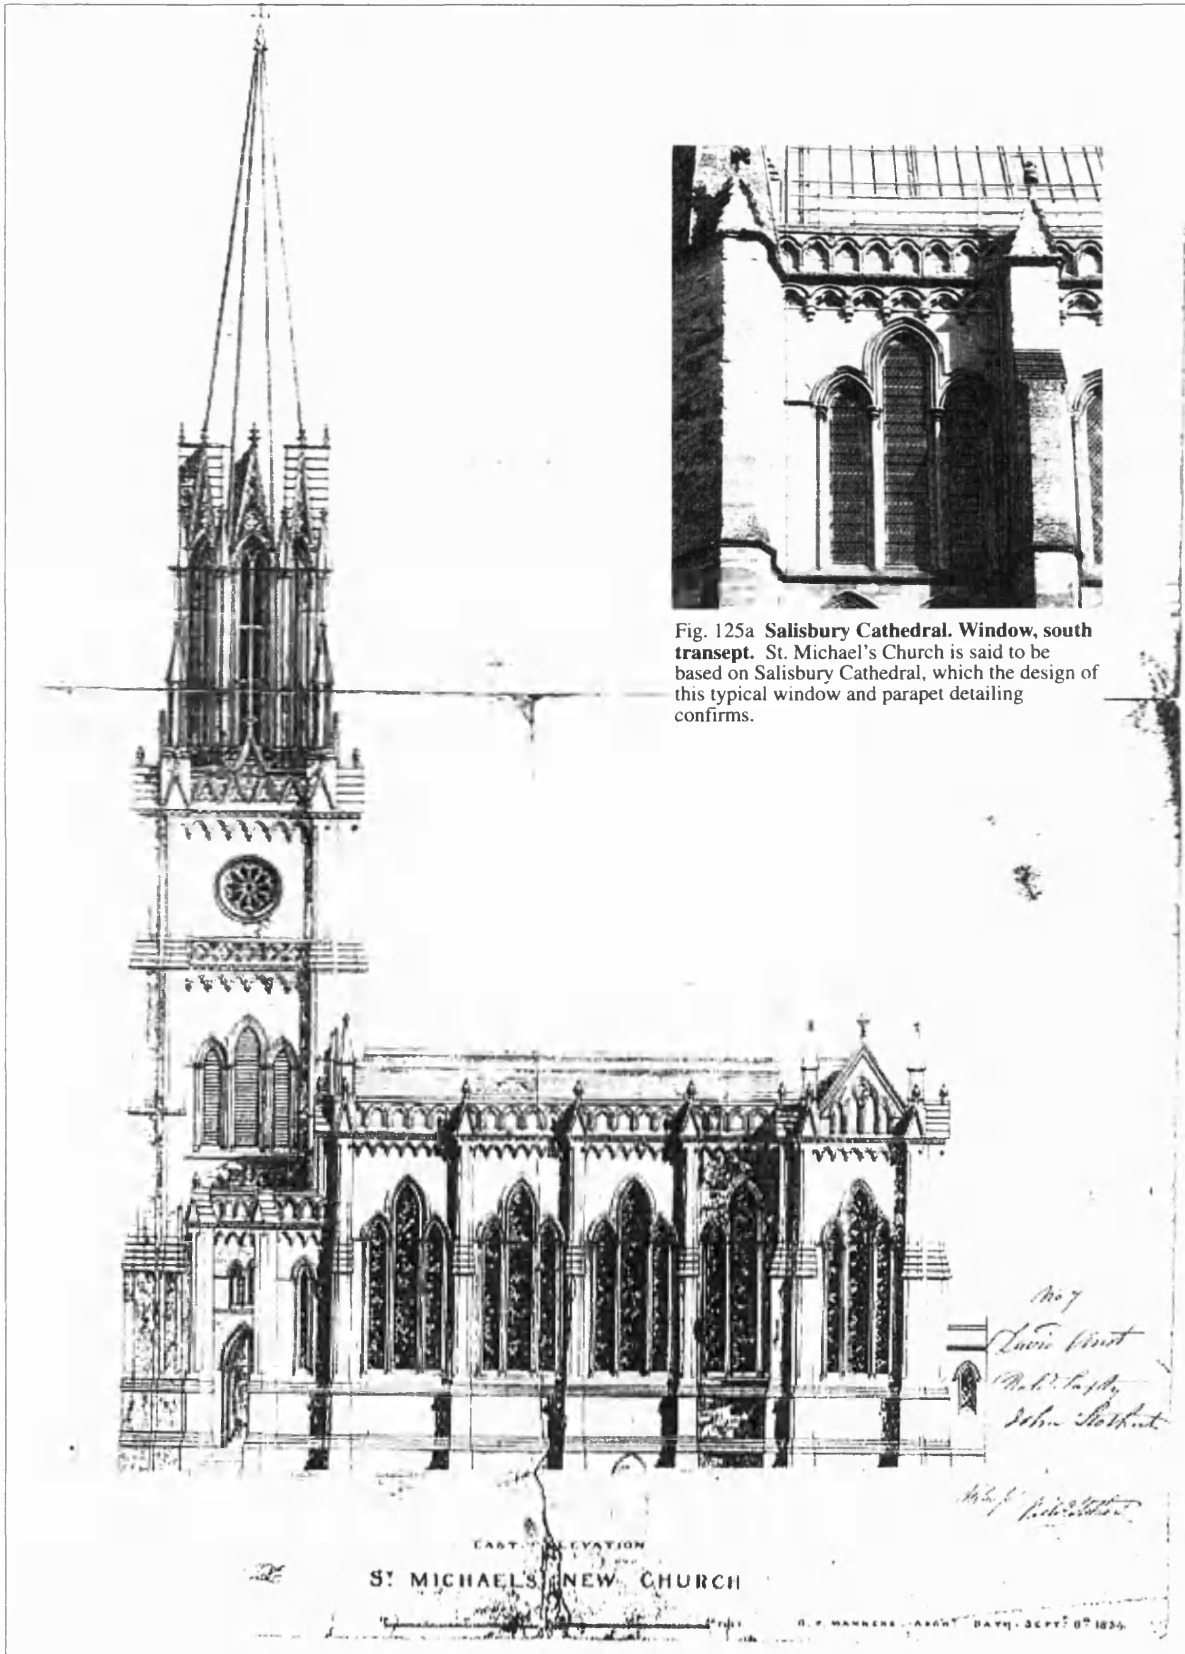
East elevation to Walcot Street. Manners' final design and contract drawing, dated Sept 4th 1834. [Biggs 5204]
